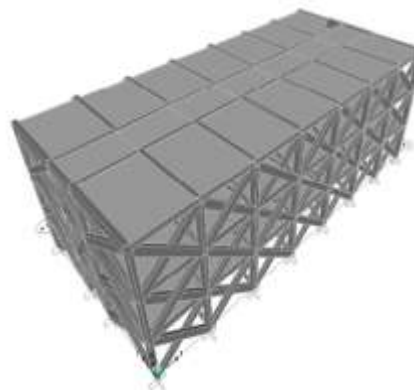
Three-Dimensional view of the representing Infills Frame with Braces
